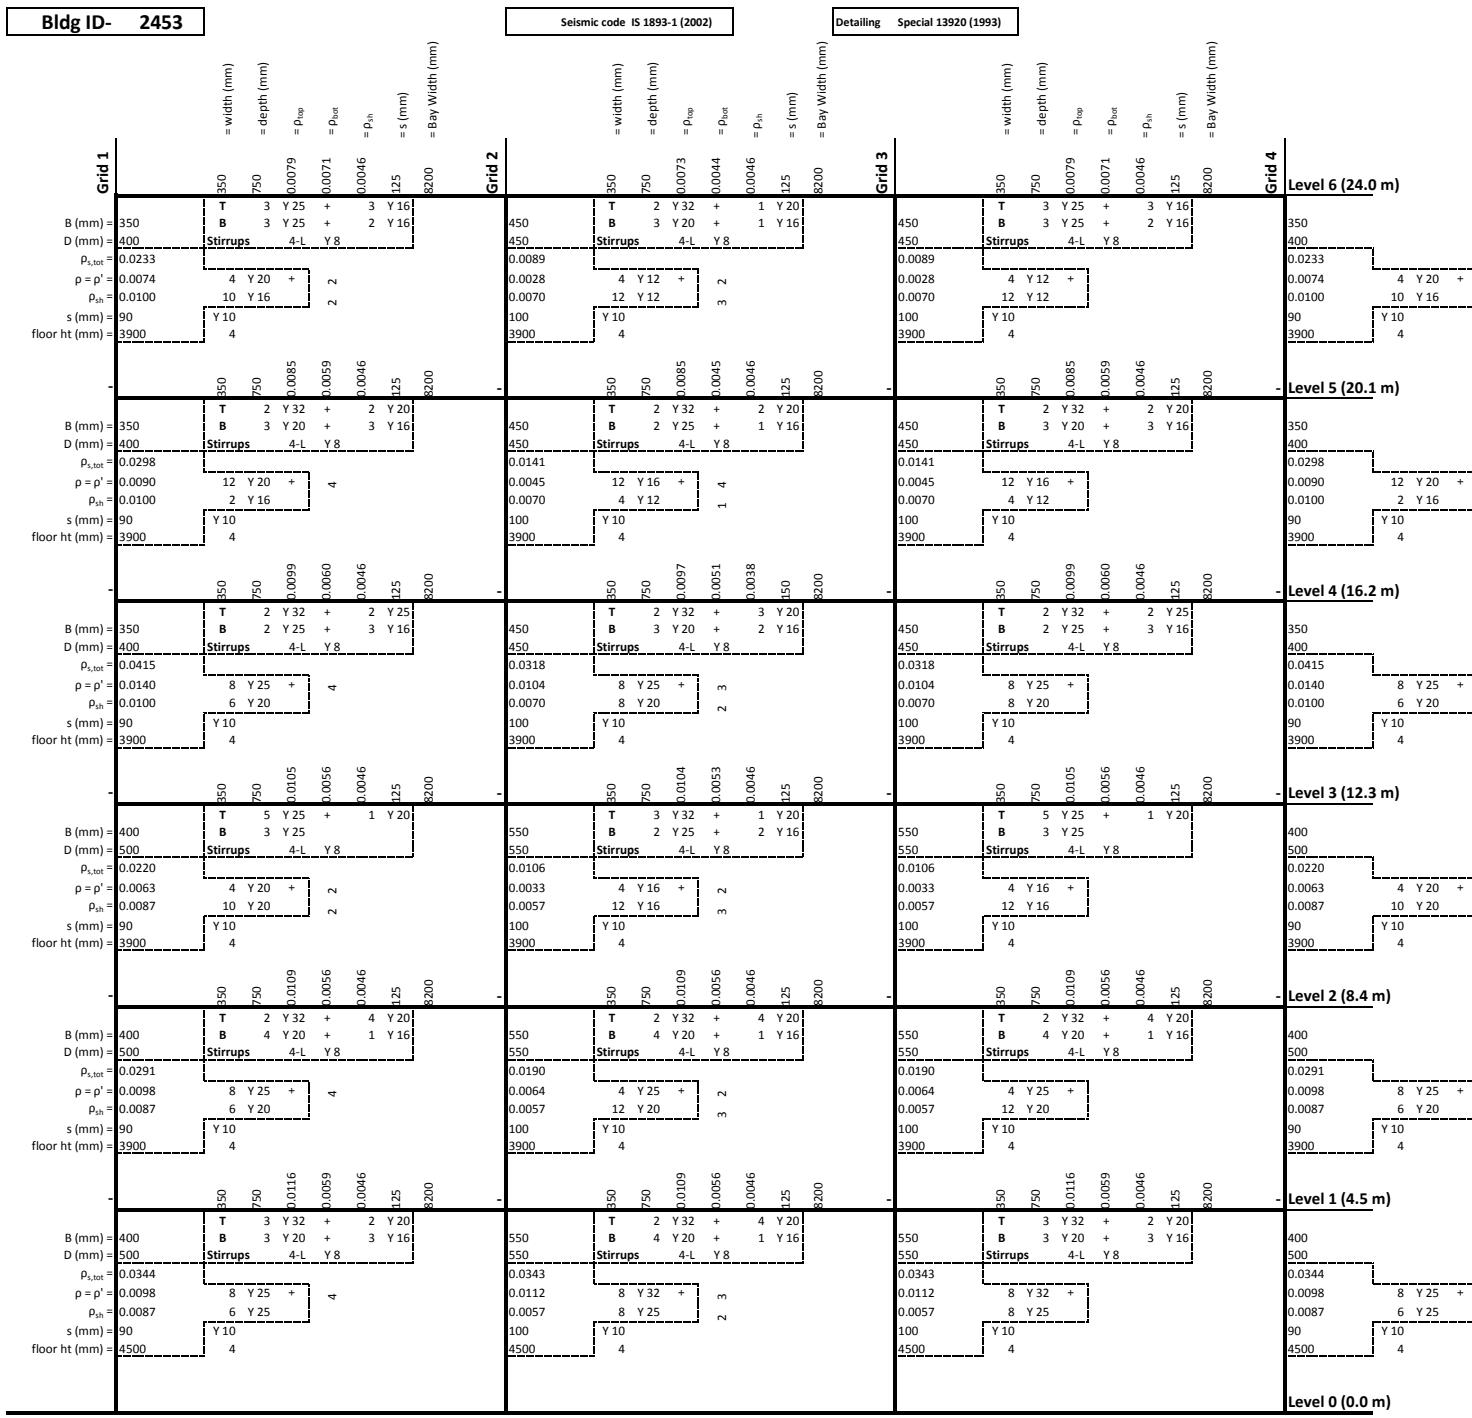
Provided reinforcement and modeling details for building ID 2453
